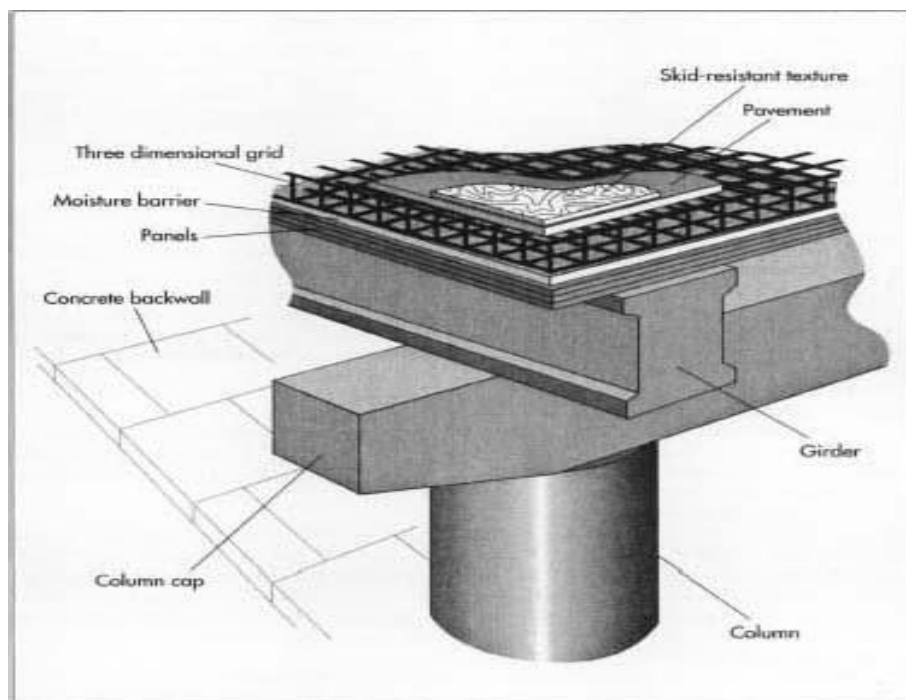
CUTWAY VIEW OF TYPICAL CONCRETE BRIDGE.
